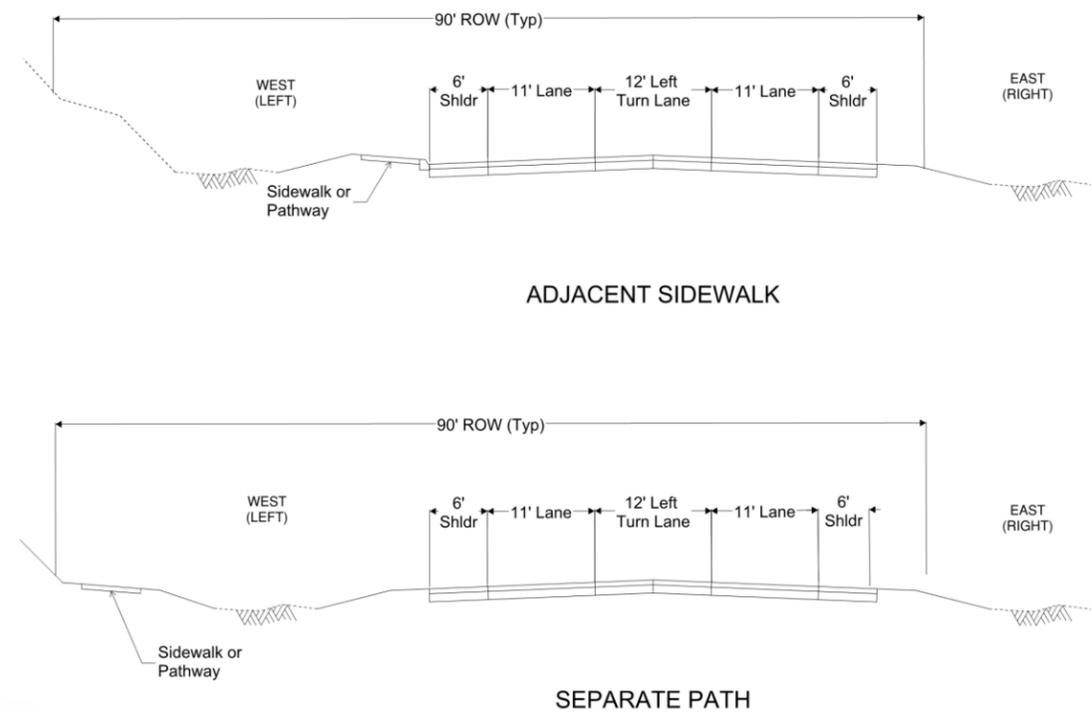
Pedestrian Facilities, West Side Only – Typical Sections
